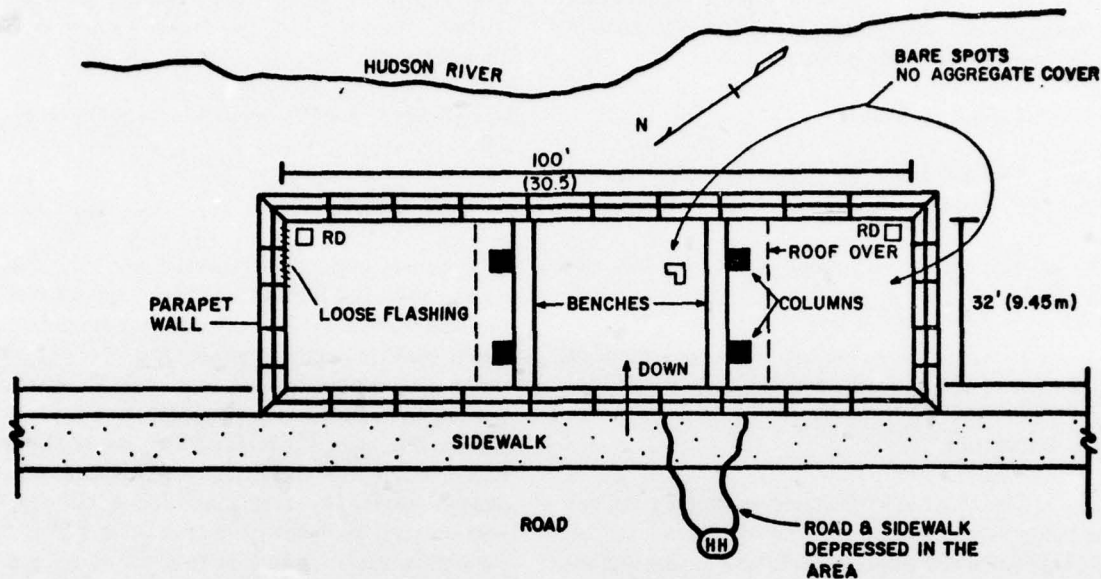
Roof on Building No. 609, U.S. Military Academy.
